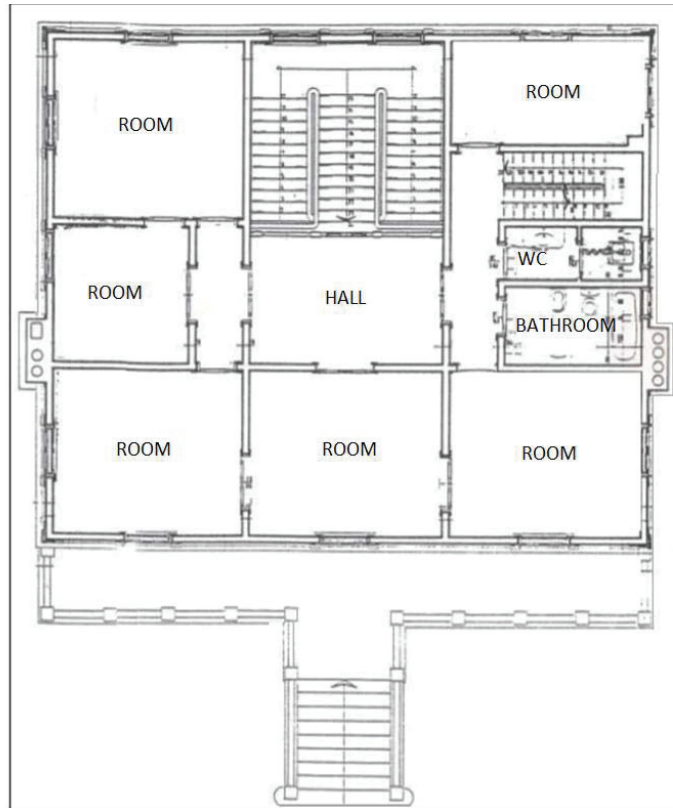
First floor plan of Şukru Bey. (Source : Ateş 2008)
